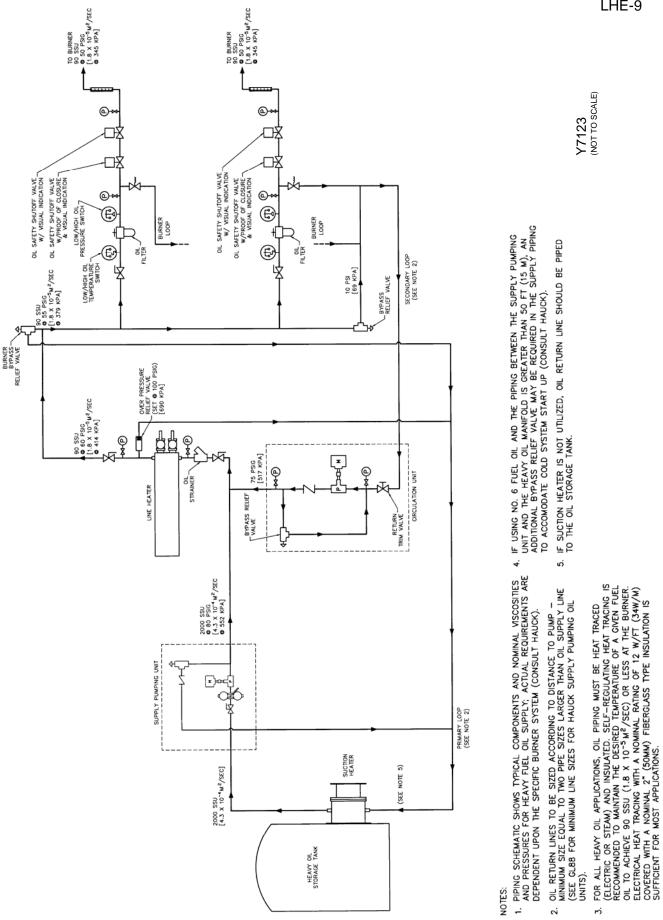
Typical Heavy Oil Piping - Multiple Burner System
